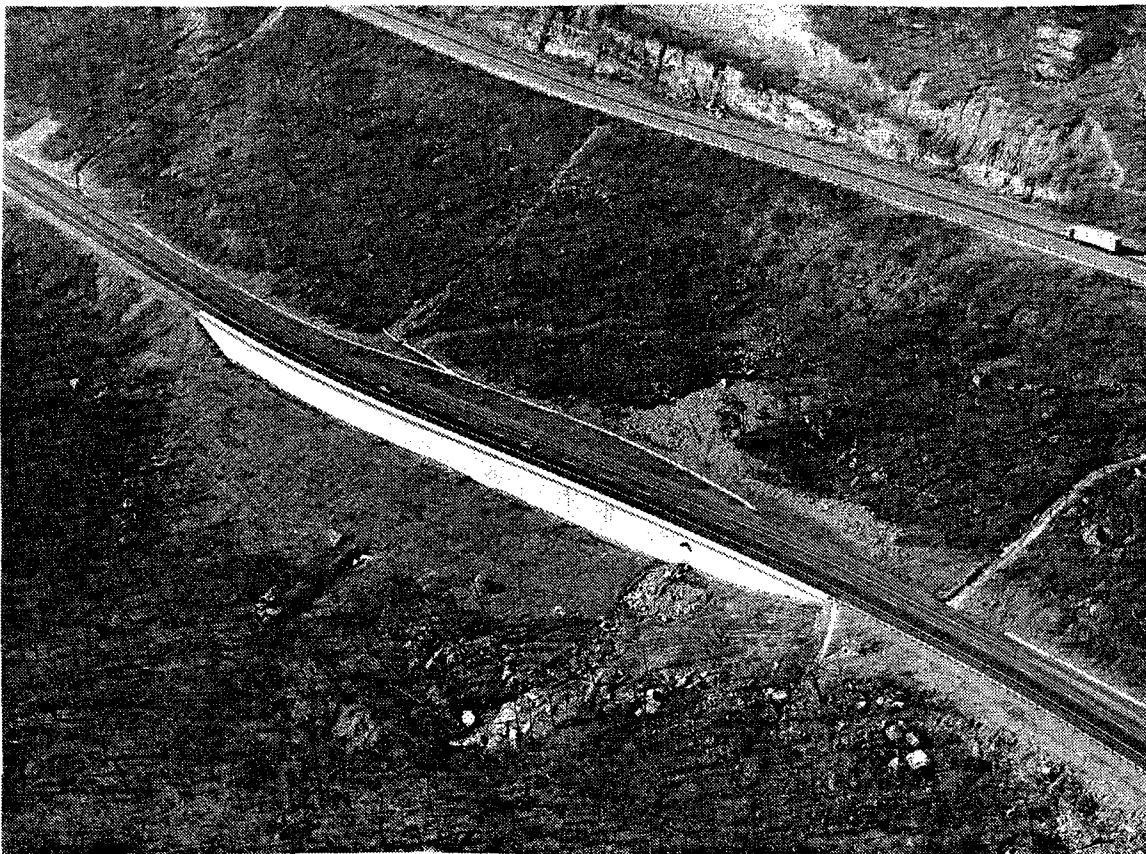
A Reinforced Earth structure was used to correct a major embankment failure on the same project.
